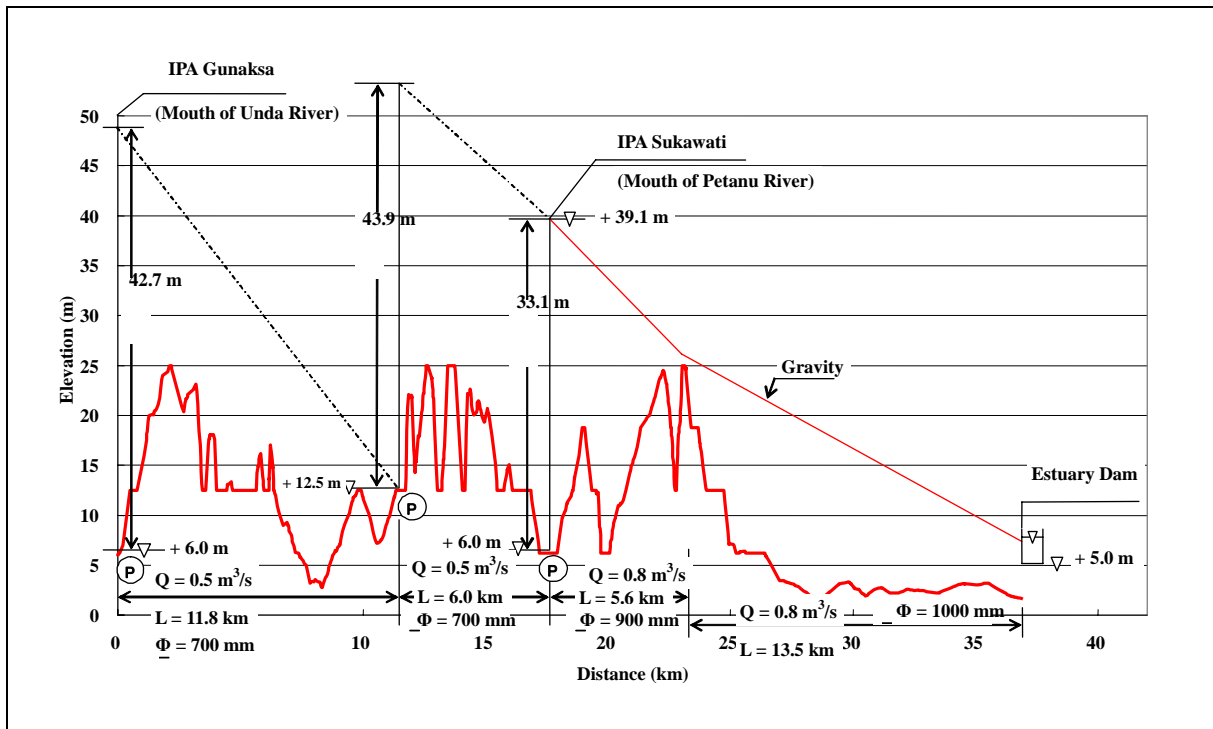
Longitudinal Section and hydraulic Gradient Line of Alternative E4
